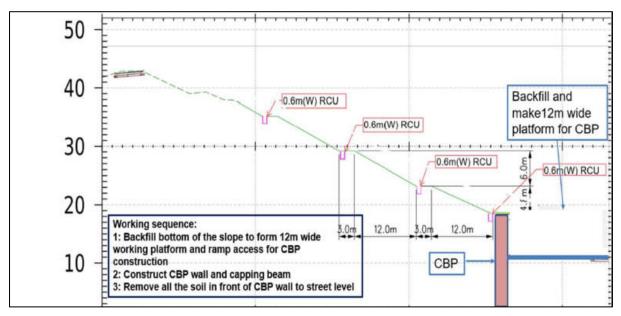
Elevation view of backfilling to existing Retaining wall to construct CBP wall
